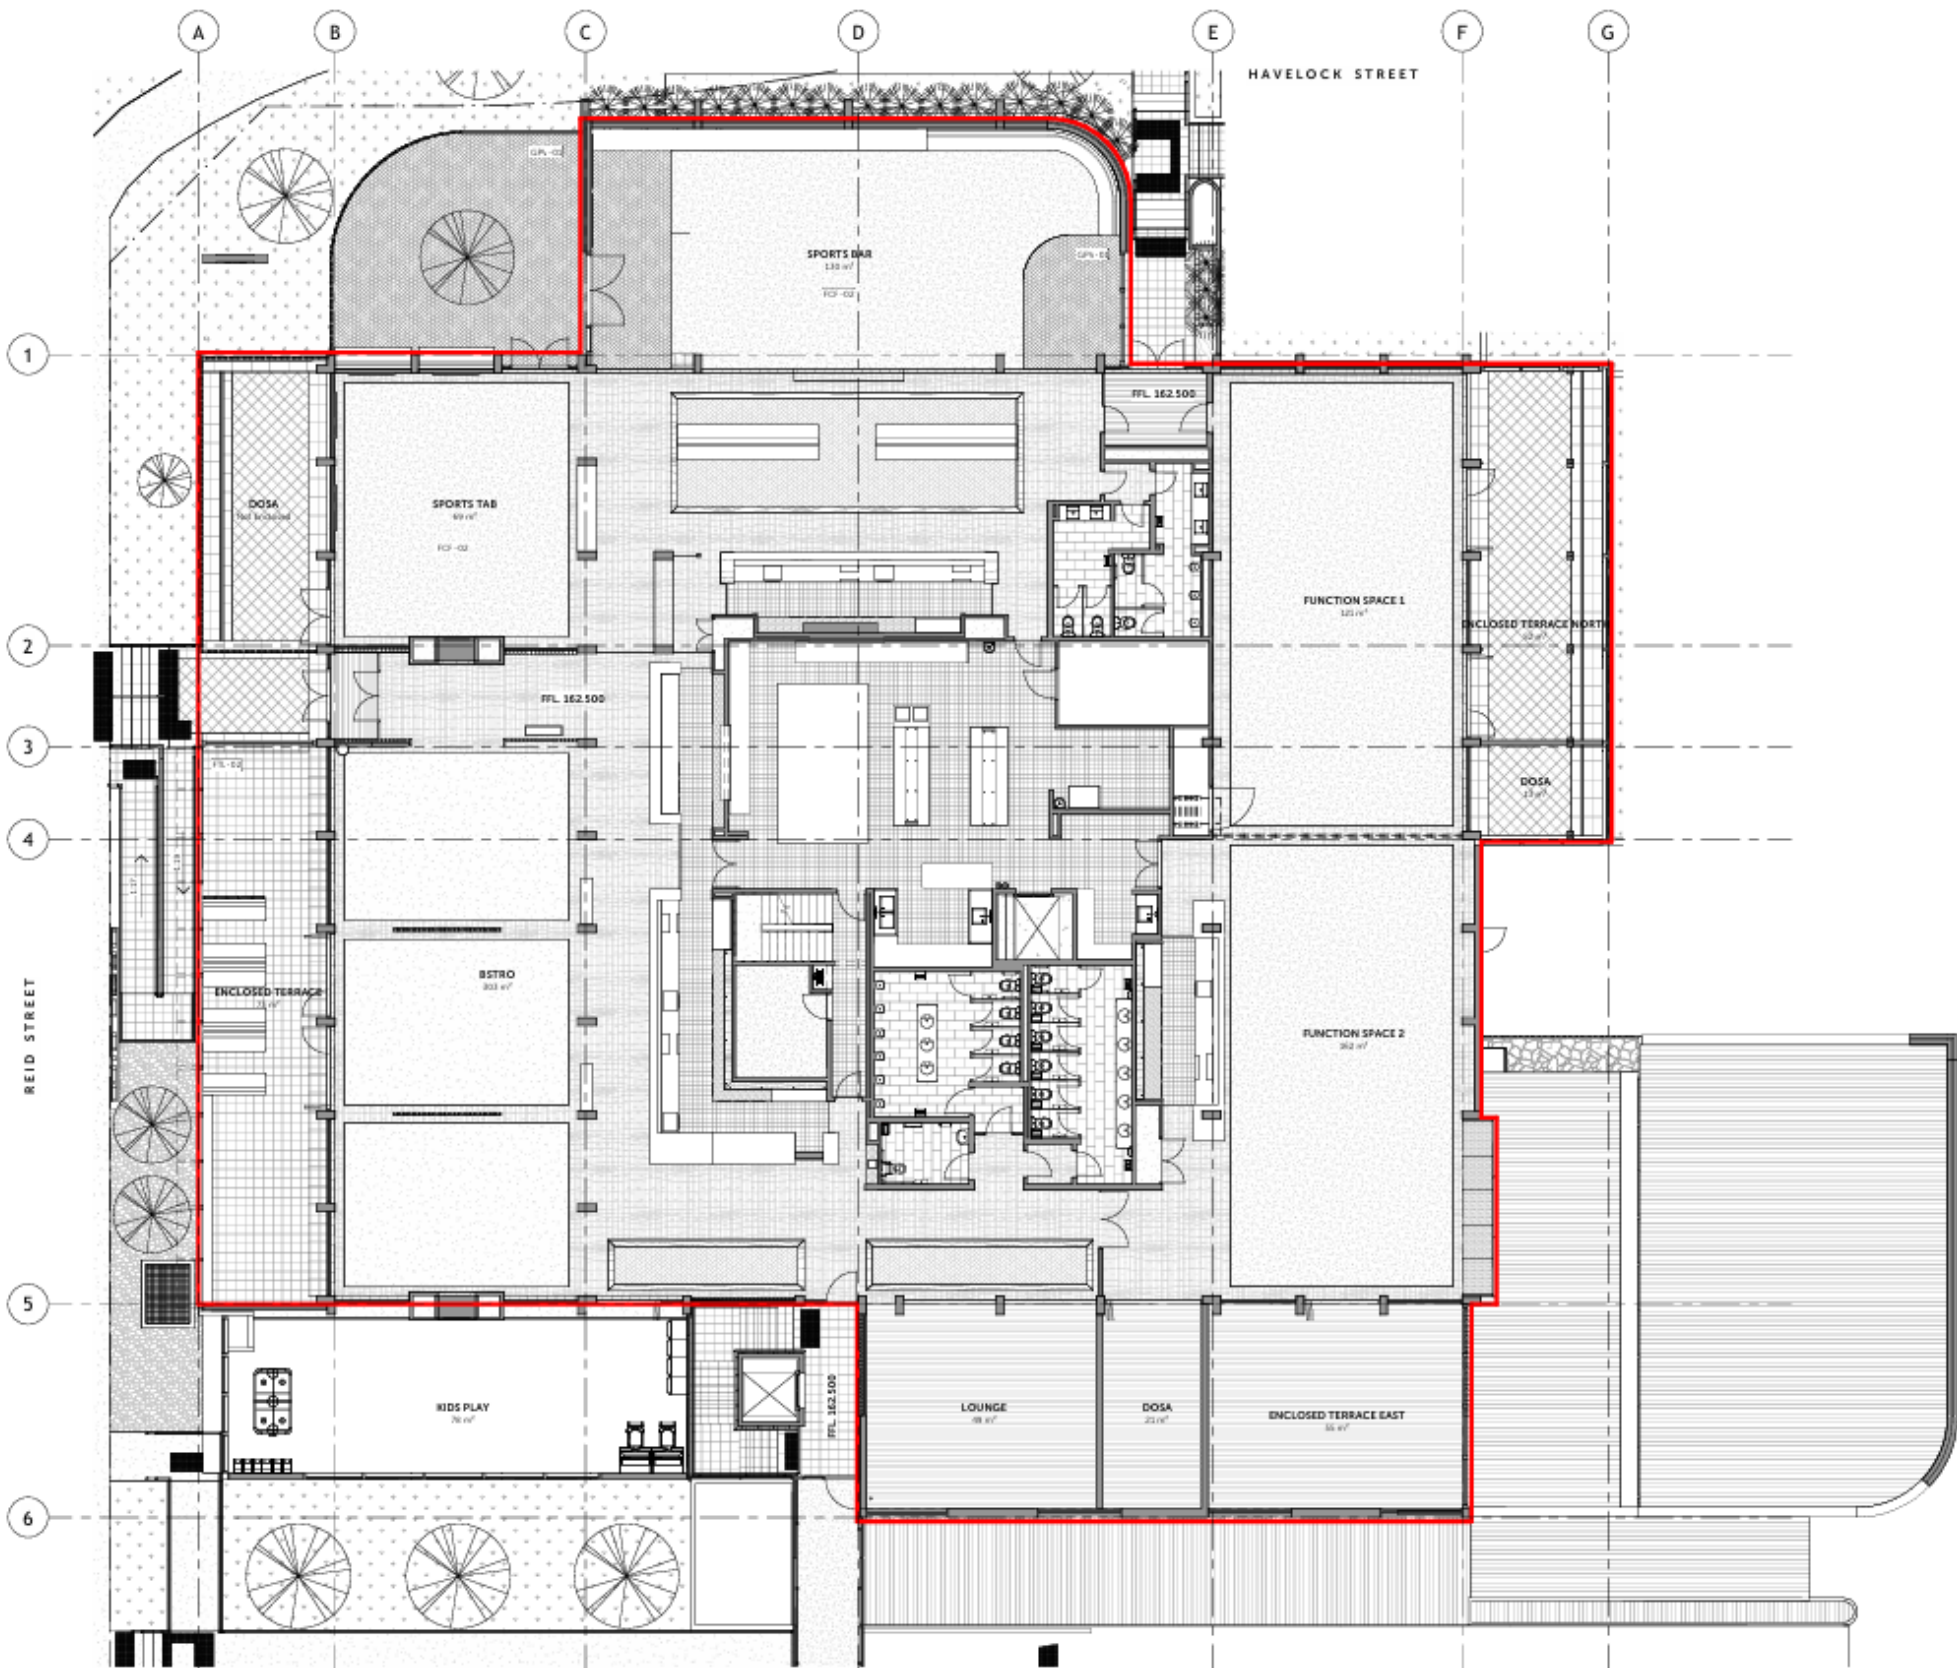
| Proposed Red and Green Line Plan – Lower Ground Floor – Gaming Lounge Plan shows fully compliant 70 EGM layout
